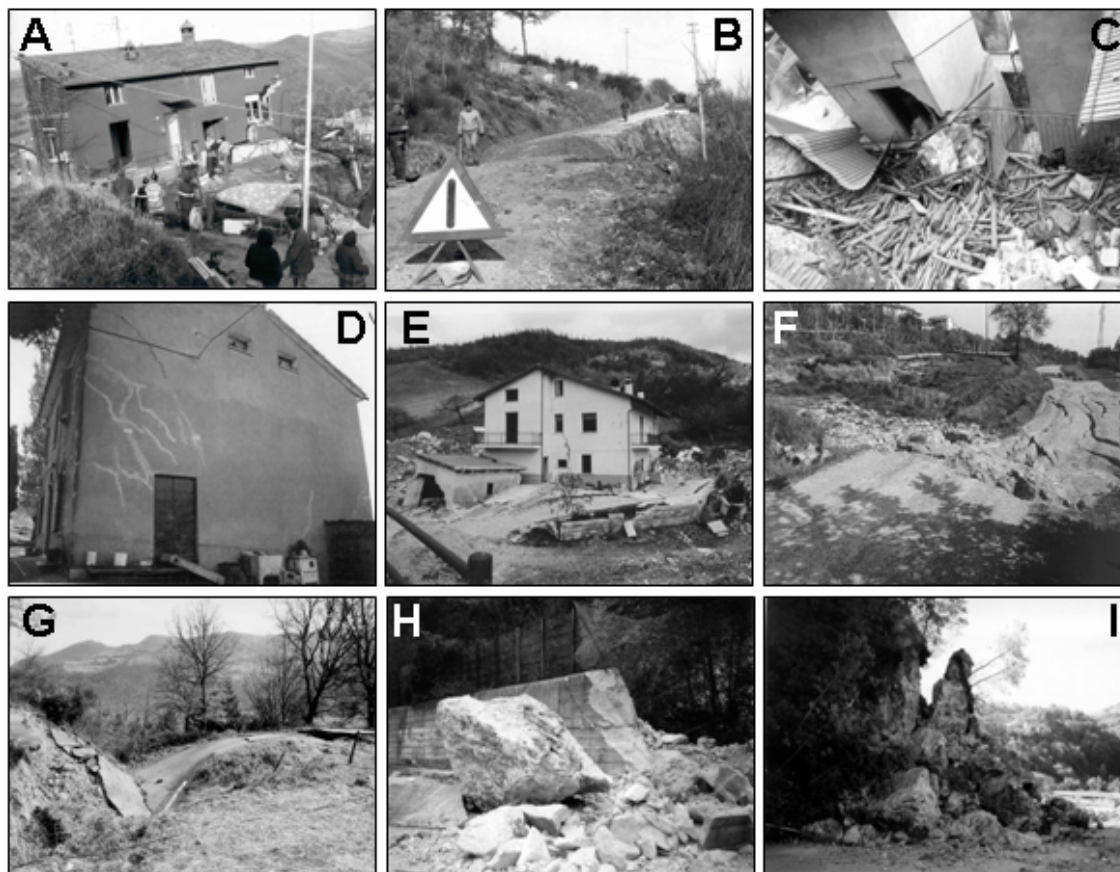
Typical landslide damage in Umbria. (A) House destroyed by a deep-seated slide at Monteverde on December 1982. (B) Road damaged by the Monteverde landslide. (C) House damaged by a rock fall at Piedipaterno on 15 September 1992. (D) House damaged by a deep-seated landslide triggered by rapid snow melting in January 1997 at Bivio Saragano. (E) House destroyed by the Valderchia landslide of 6 January 1997. (F) Road damaged by a deep-seated slump at San Litardo in January 1997. (G) Road damaged by a deep-seated slump at Marcignano in January 1997. (H) Damage due to rock falls triggered by the October 1997 earthquake along road SS 320. (I) Rock fall and toppling failure caused by the September-October 1997 earthquakes along a provincial road near Stravignano.
